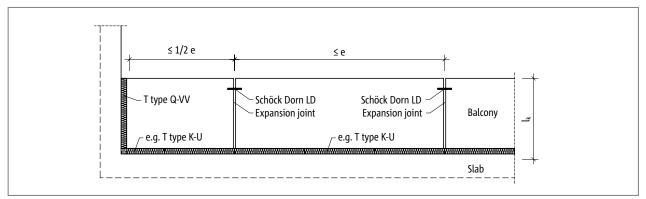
Schöck Isokorb® T type K-U: Expansion joint layout
